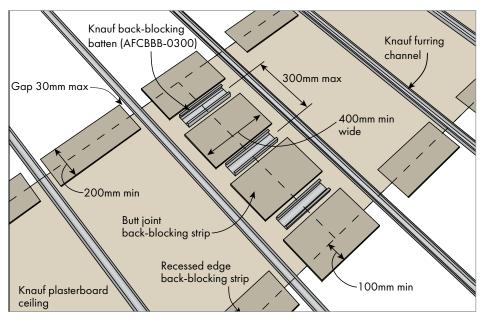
Placement of Knauf Back-Blocking Batten and Back-Blocking Strips for Recessed and Butt Joints
